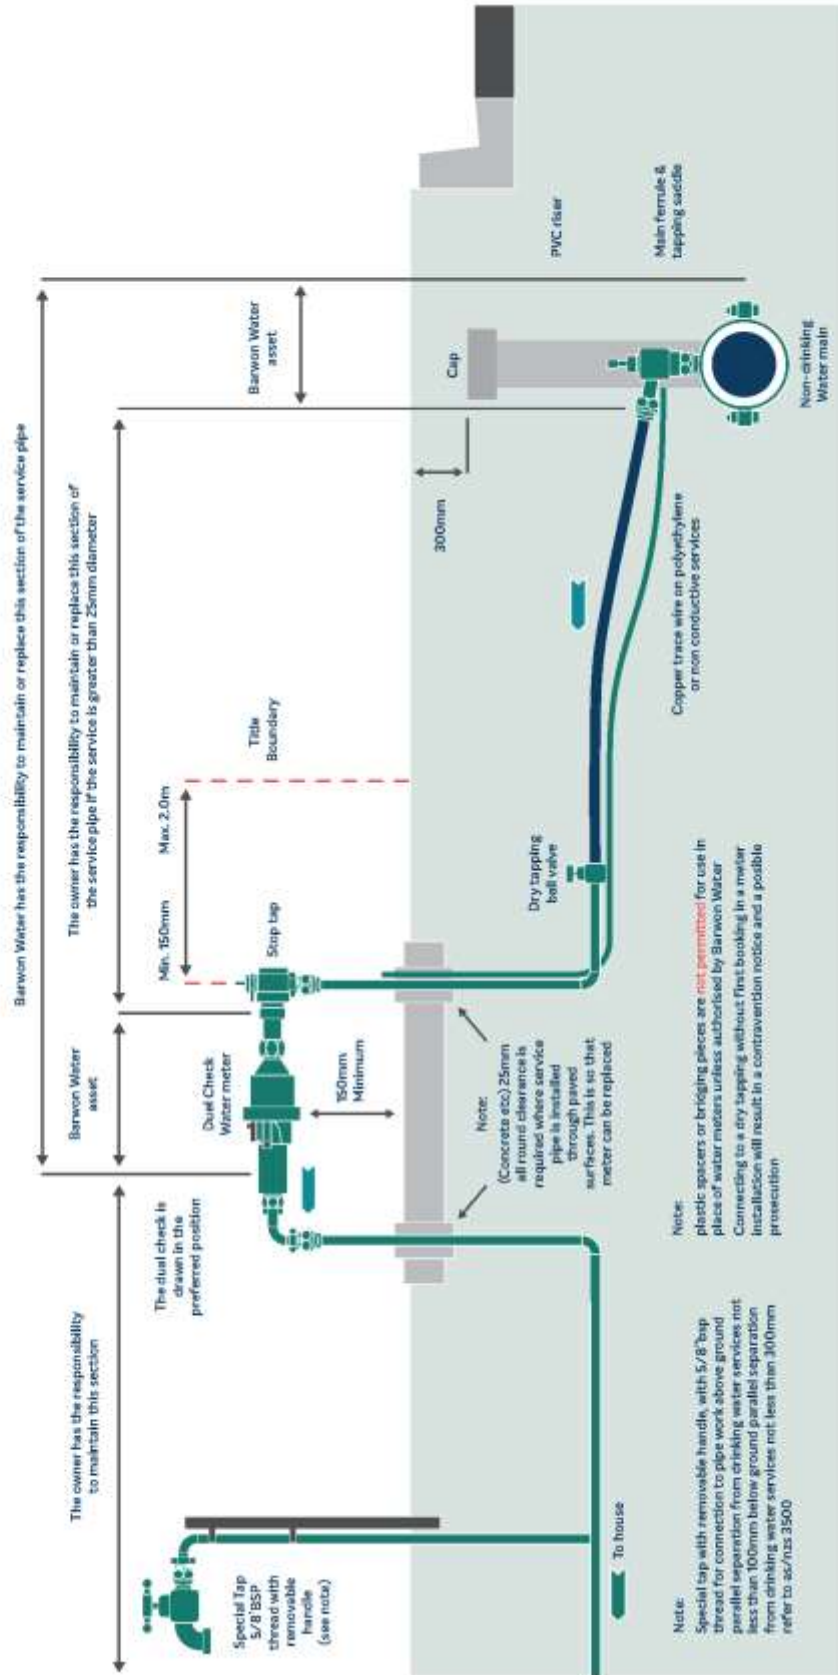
20 & 25mm Non drinking water meter installation – Not to be used for drinking water
